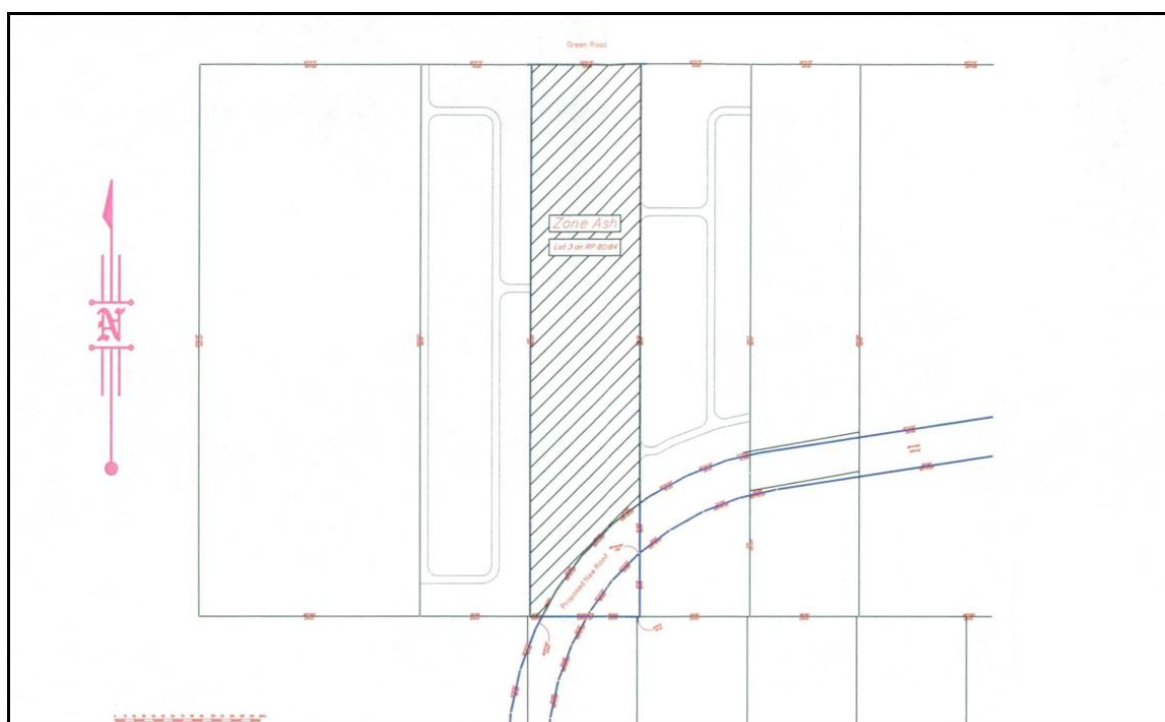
Proposed Concept Plan of Subdivision for the Pre-lodgement meeting, Prepared by Oasis Town Planning)
